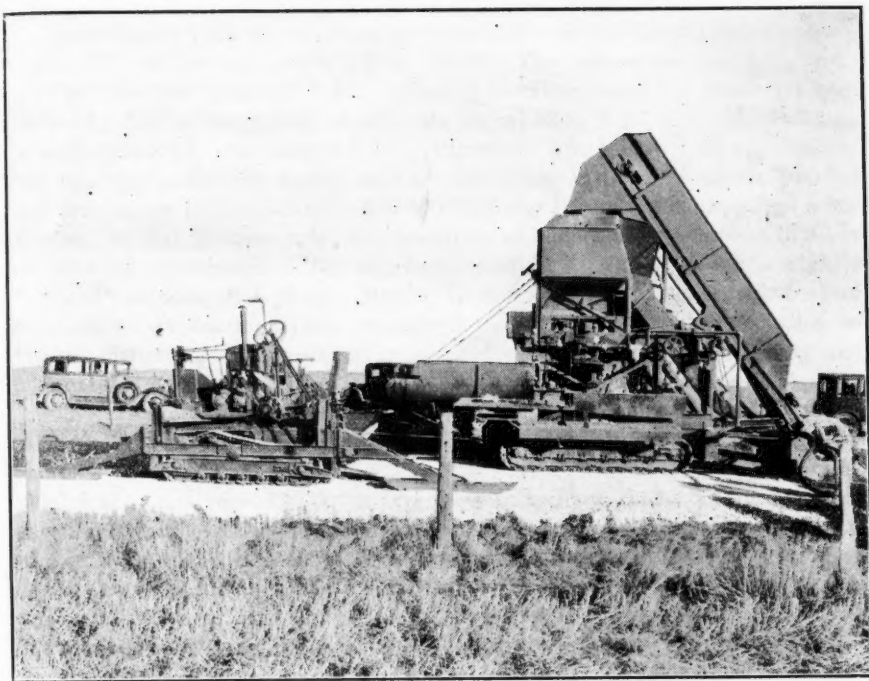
A MODERN TYPE OF ROAD-BUILDING EQUIPMENT.
